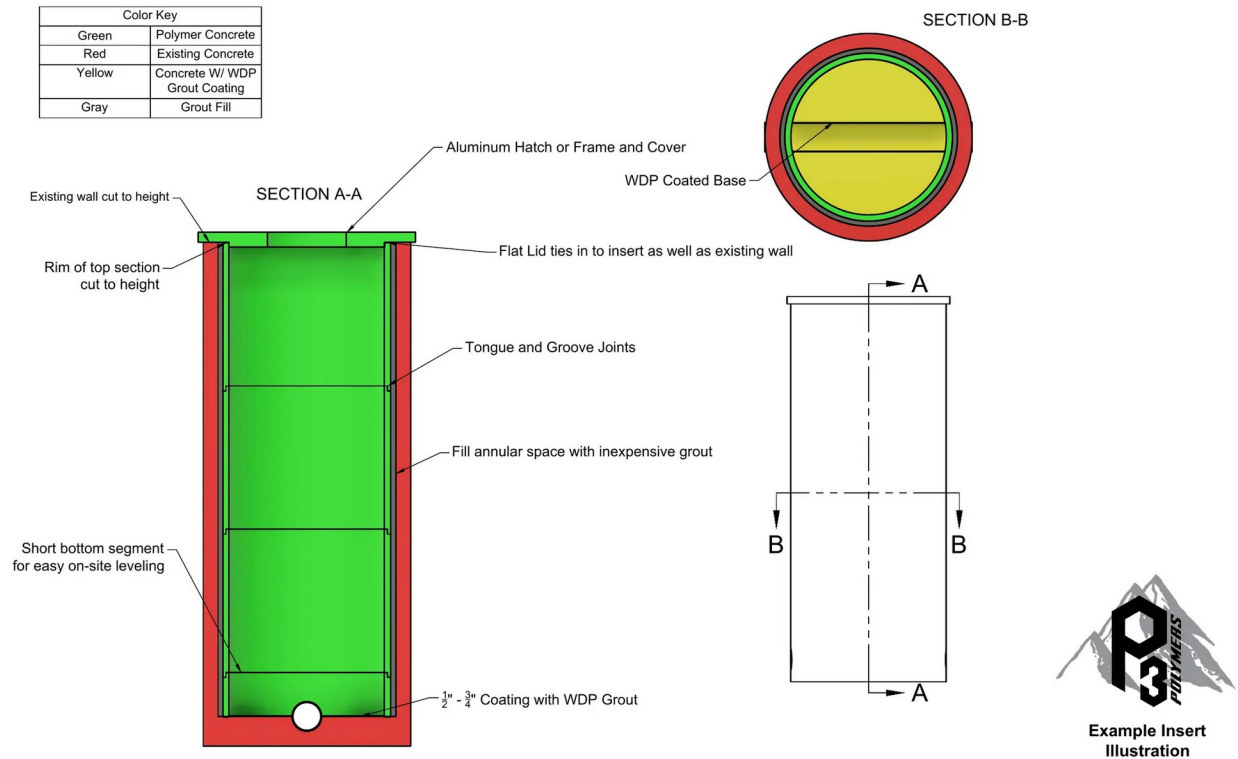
| EXAMPLE INSERT ARRANGEMENT - NOT A PROJECT SHOP DRAWING
